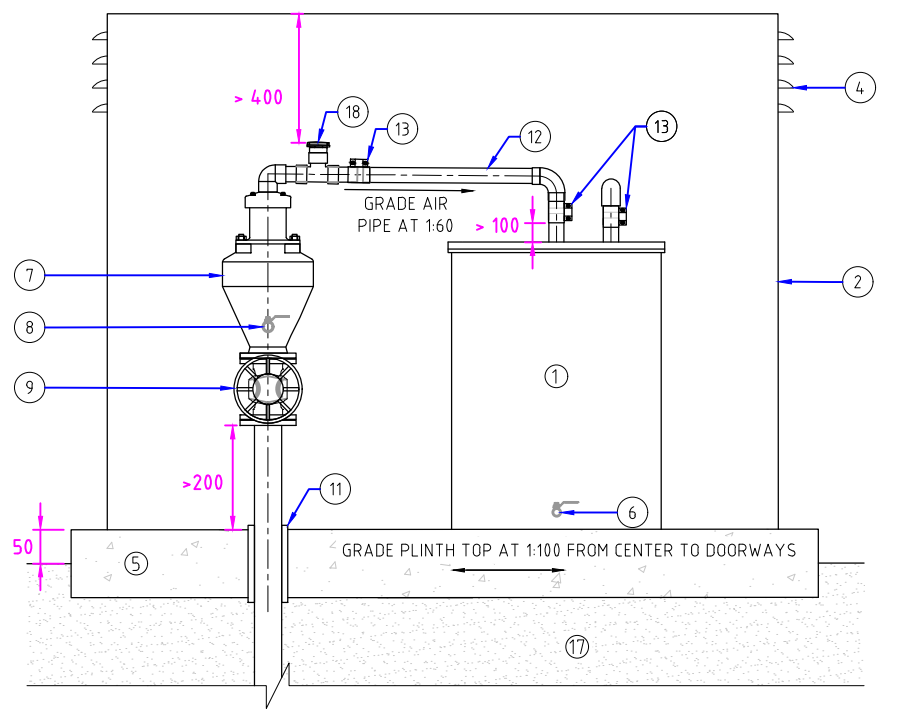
ABOVE GROUND AIR VALVE AND CARBON CANISTER ASSEMBLY (SECTION A)
